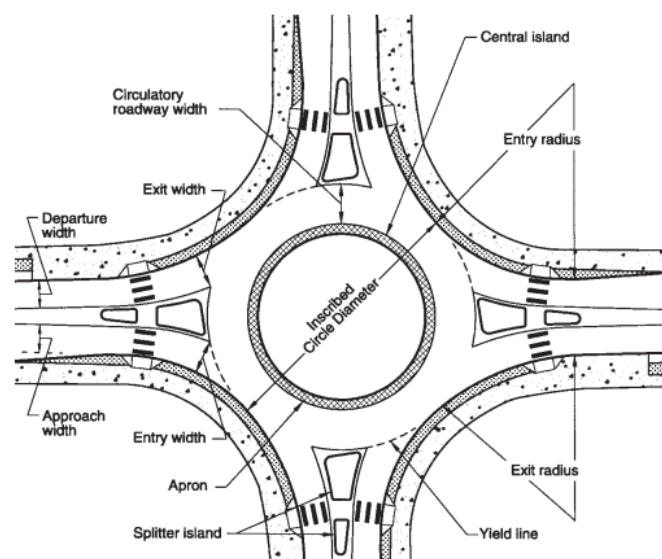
Basic Geometric Element of a Roundabout (FHWA, 2000)
